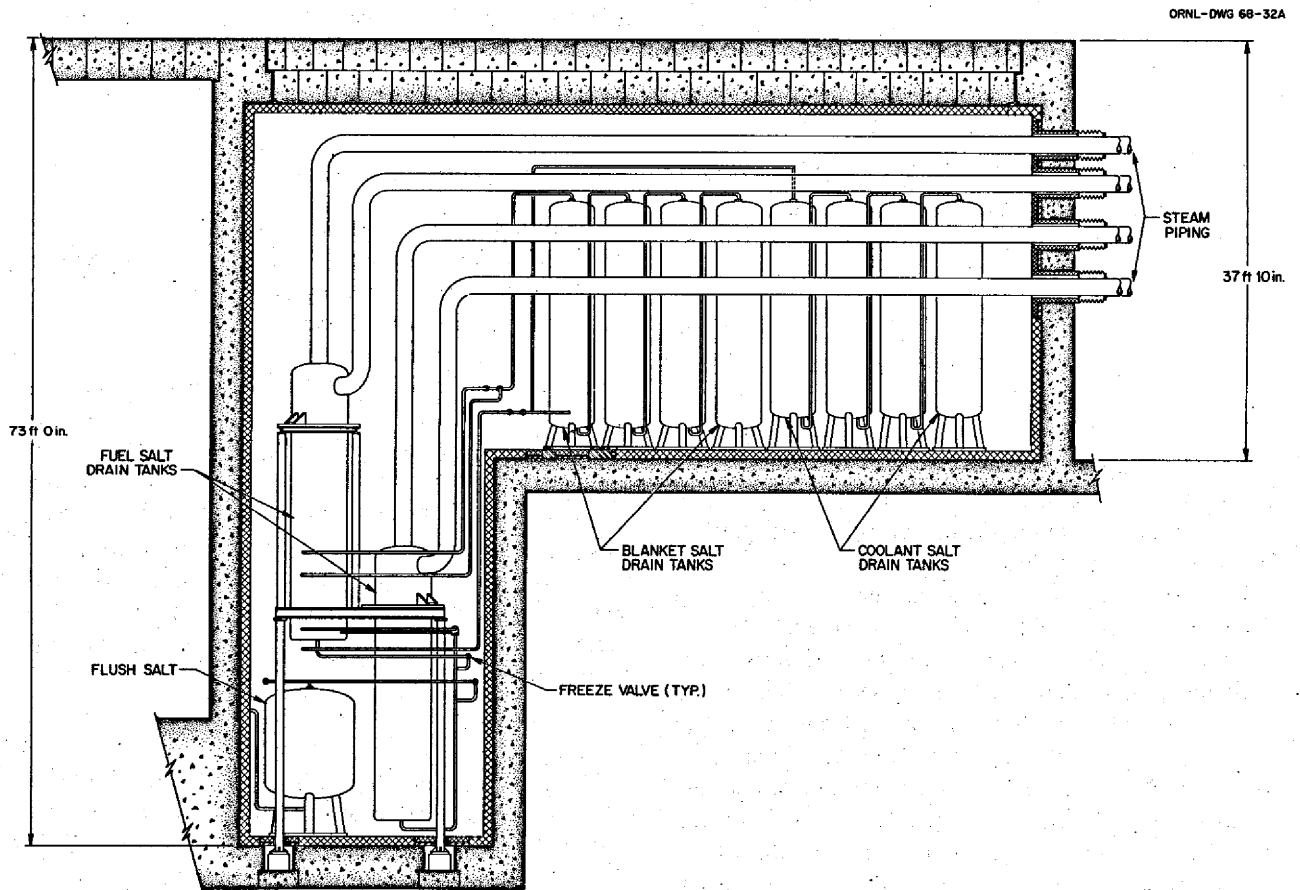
Cross Sectional Elevation of Drain Tank Cell.
